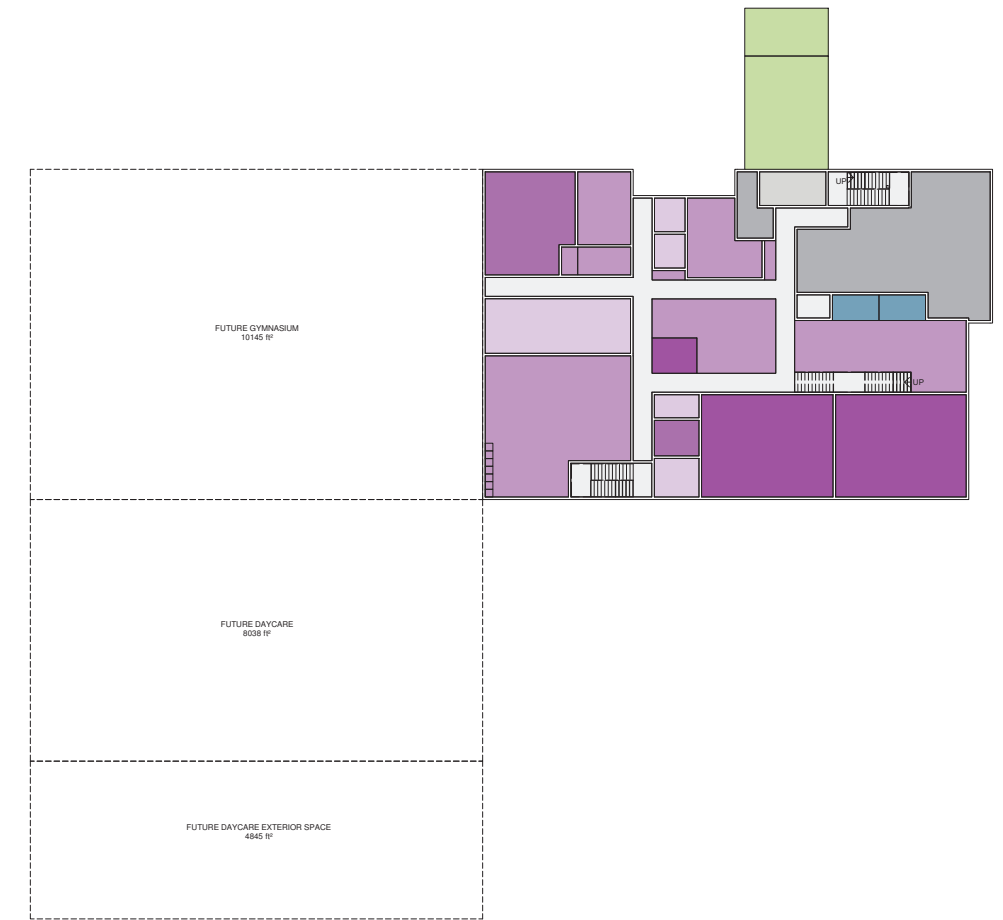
Colwood Community Center - Level 1 Conceptual Floor Plan - Phase 2
